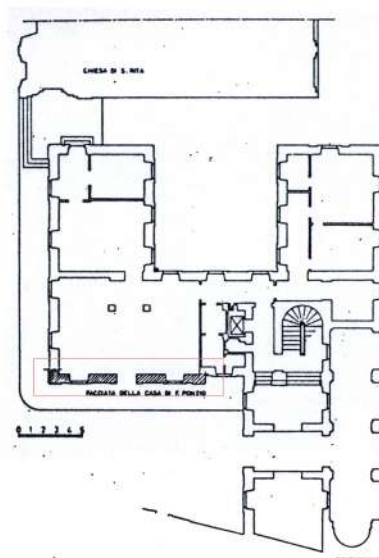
Plan of the building in Piazza Campitelli on which the façade of Flaminio Ponzio's house in Via Alessandrina was grafted (in White).
